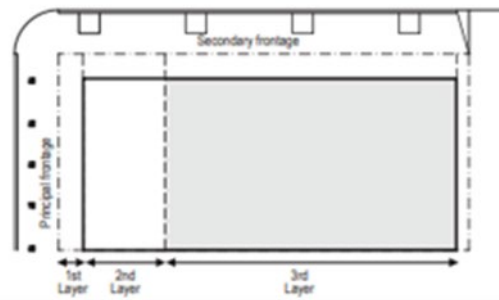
Building Form exhibit from the Central US 1 Corridor Sector Plan
